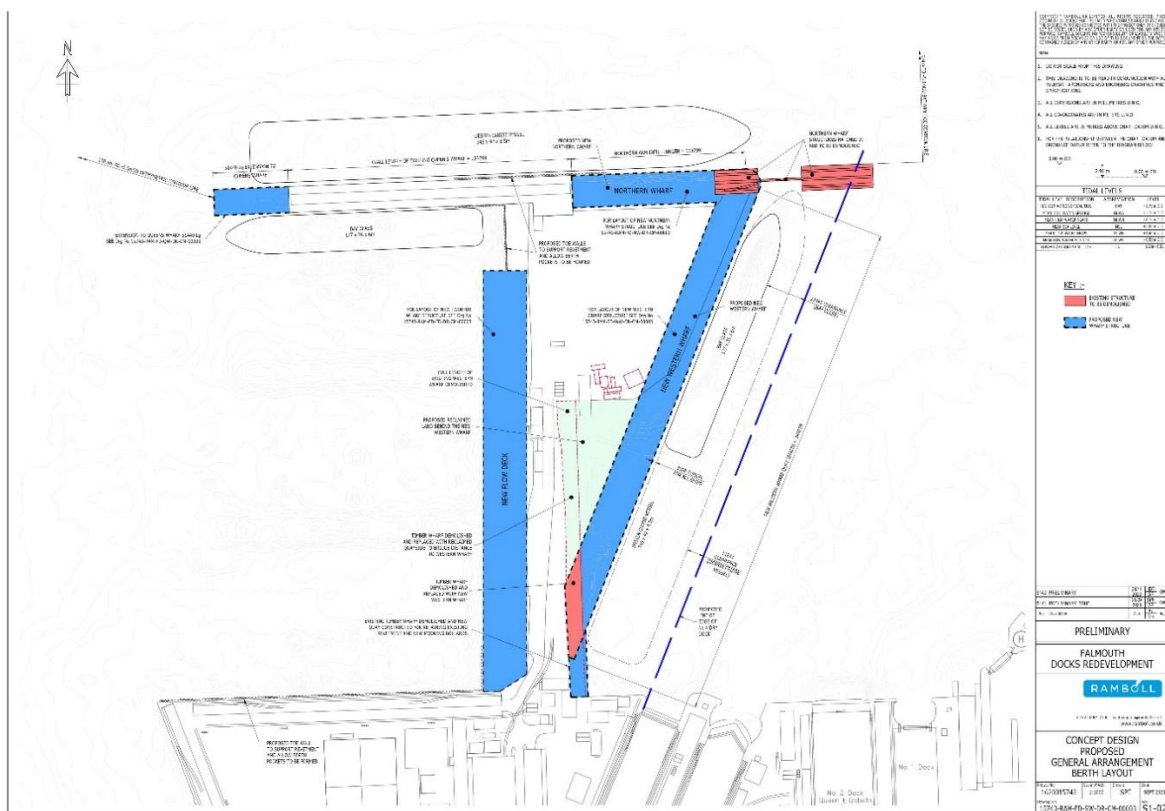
Proposed Development Site Arrangement Plan (areas to be demolished – red, new wharf lengths – blue)
